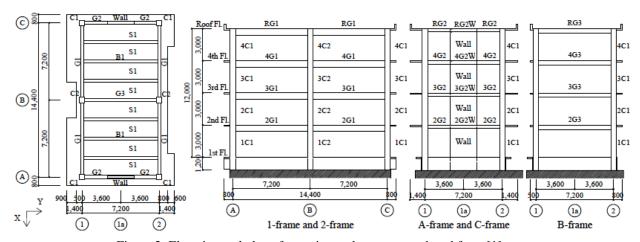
Elevation and plan of experimental setup, reproduced from [1].
